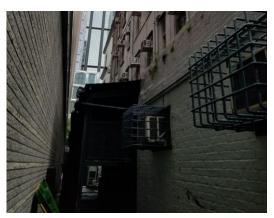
Temporary structures at the open spaces adjacent to east and west wings 2023 [by author]
